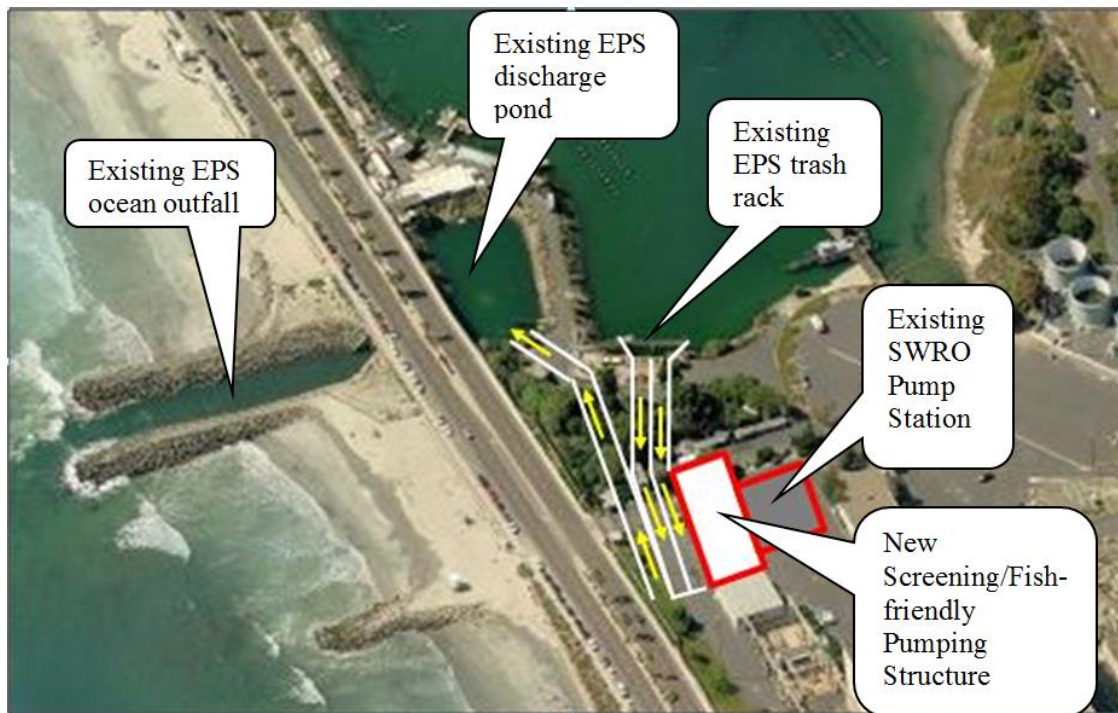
General layout of the CDP and location of the New Screening/Fish-friendly Pumping Structure.
